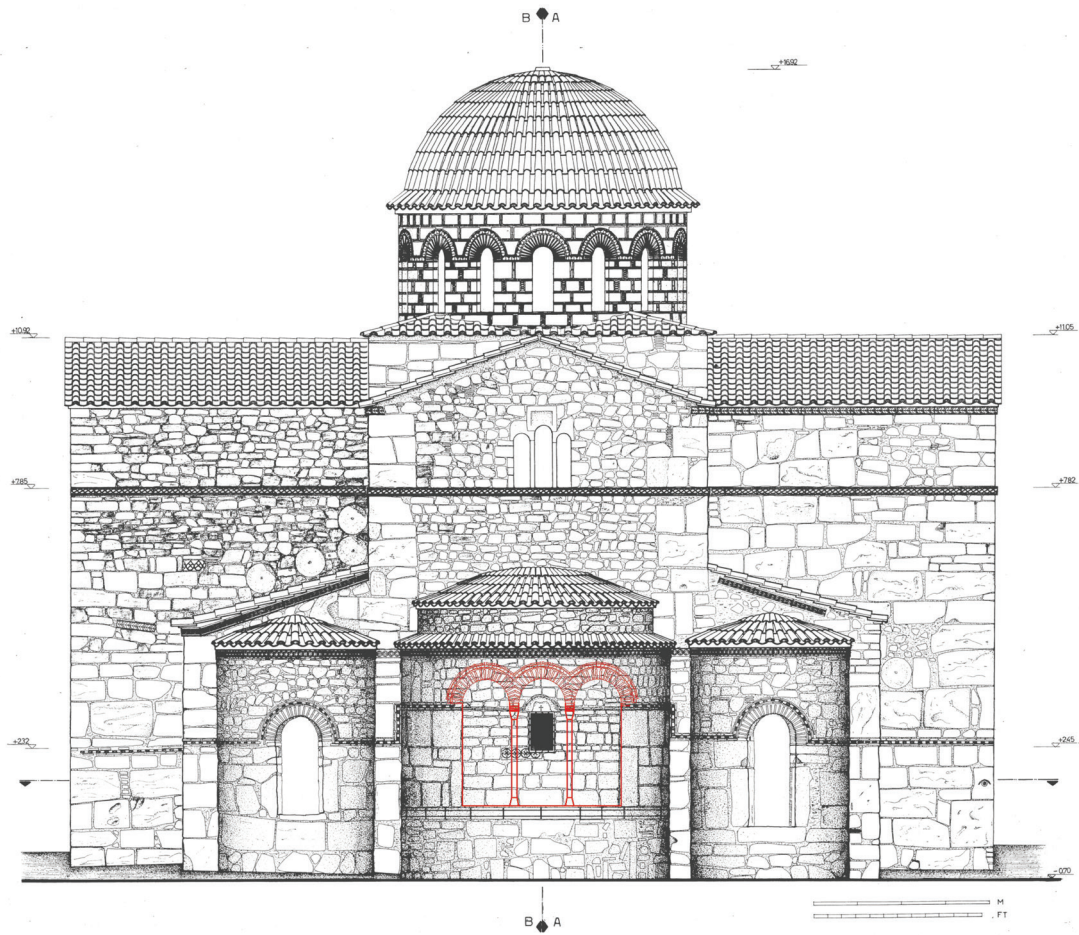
Panagia Skripou. East elevation. The proposed graphical reconstruction of the apse window in red.
